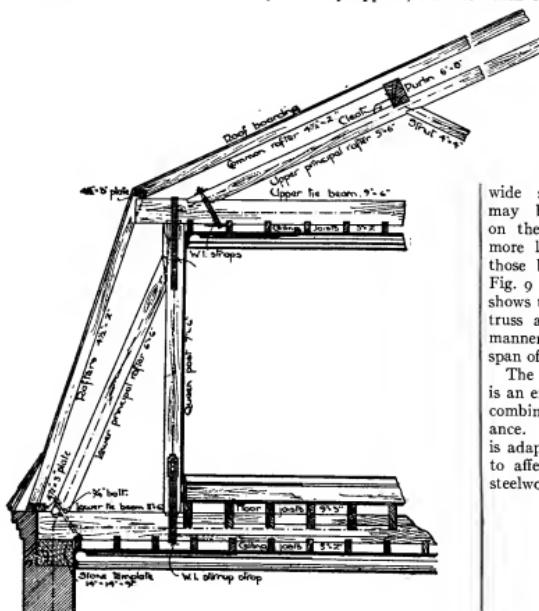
Mansard Roof Truss: detail of outline as A; other outlines at B, C, D and E.
